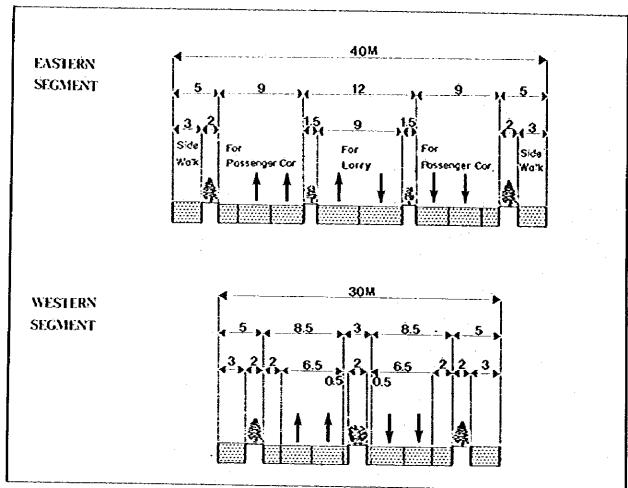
PROPOSED TYPICAL CROSS SECTION
